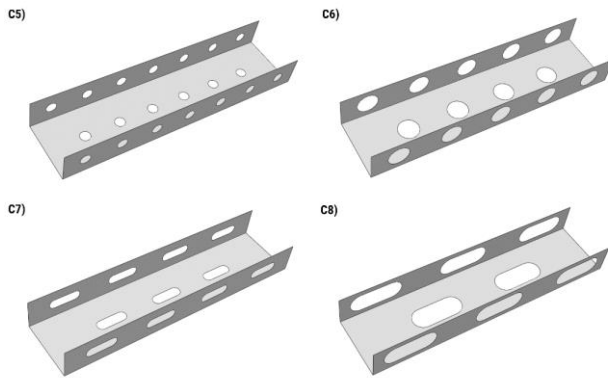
Models of C-section profiles with a variant of arrangement of holes in a chess sequence: (C5) circular holes with a diameter of 10 mm, (C6) circular holes with a diameter of 20 mm, (C7) bean-shaped holes with a dimension of 30 mm × 10 mm (R = 5 mm), (C8) bean-shaped holes with a dimension of 50 mm × 20 mm (R = 10 mm)
